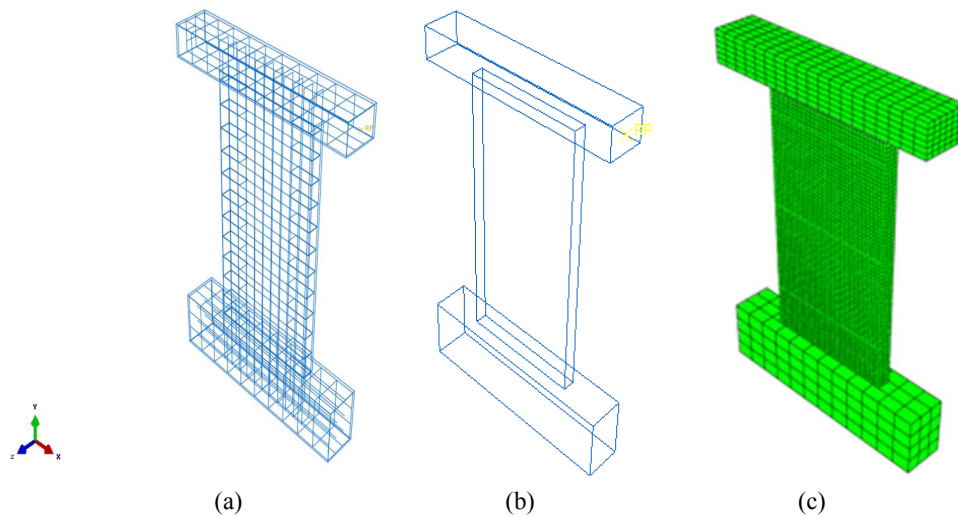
The different models (a) concrete wall with reinforcement (Model 1), (b) fictitious concrete wall without reinforcement (Model 2) and (c) EF mesh of concrete
